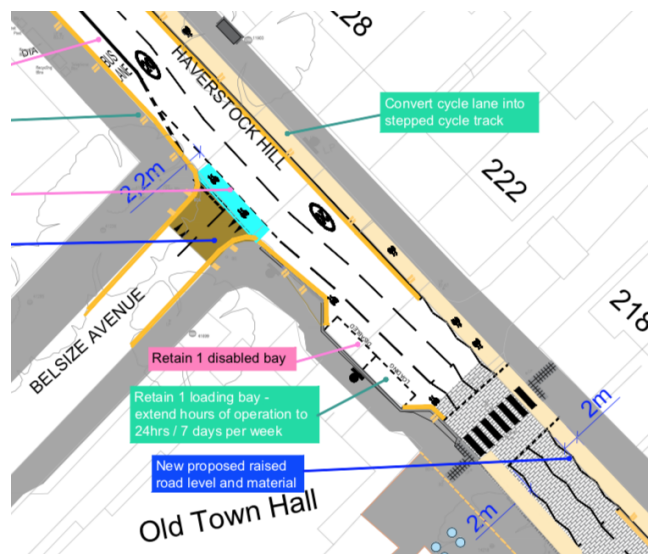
the Old Town Hall and past Belsize Avenue – from Drawing 8
